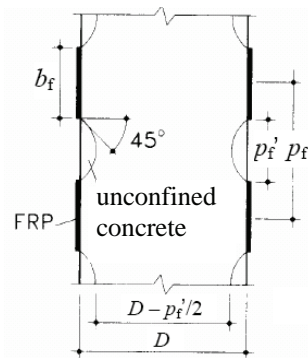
Elevation view of circular member confined with FRP strips.
